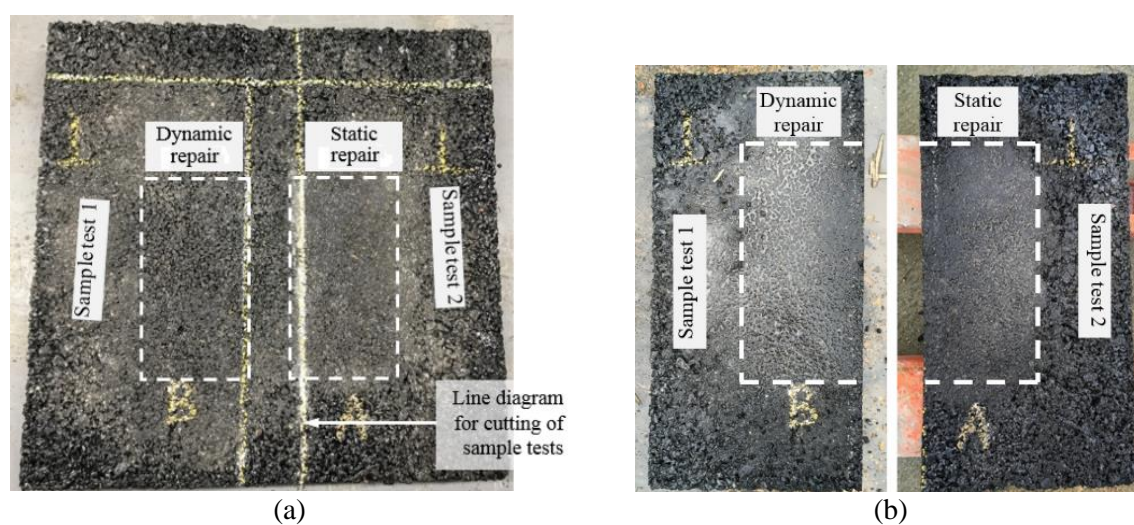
Samples for wheel tracking test: (a) initial slab; (b) sample blocks ready for wheel tracking tests (slab cut with a wet saw cut)
